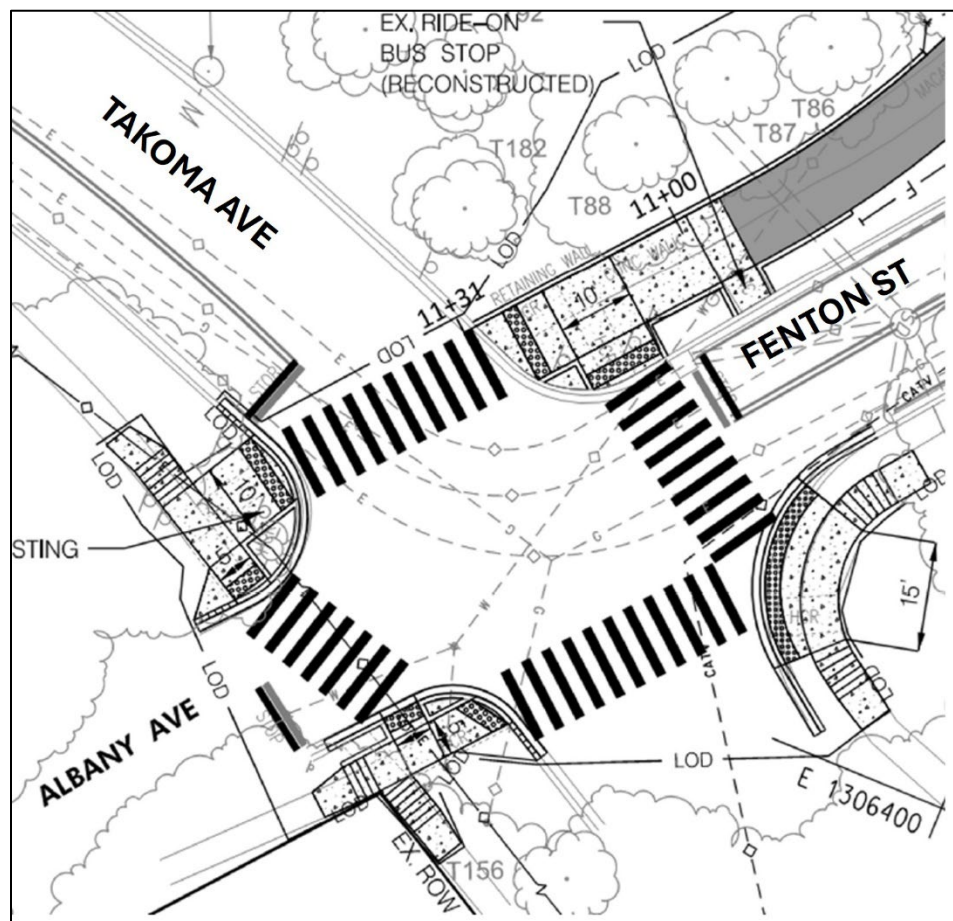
Plan View Proposed Improvements - Fenton Street/Takoma Avenue Intersection
